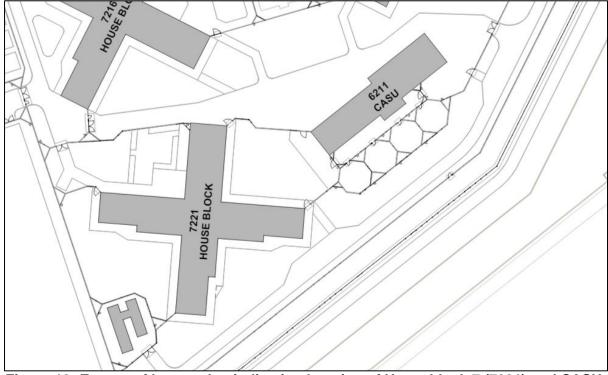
Extract of layout plan indicating location of Houseblock 7 (7221) and CASU
